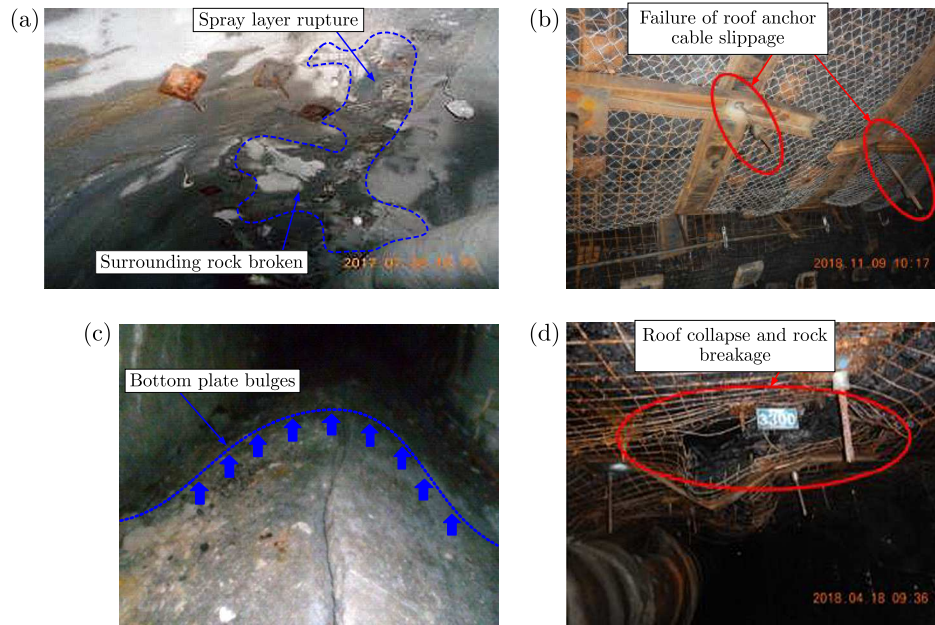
The failure mode of a weakly cemented soft rock roadway: (a) spray layer rupture, (b) roof anchor cable slippage, (c) deformation of the bottom plate, (d) failure of the roof
